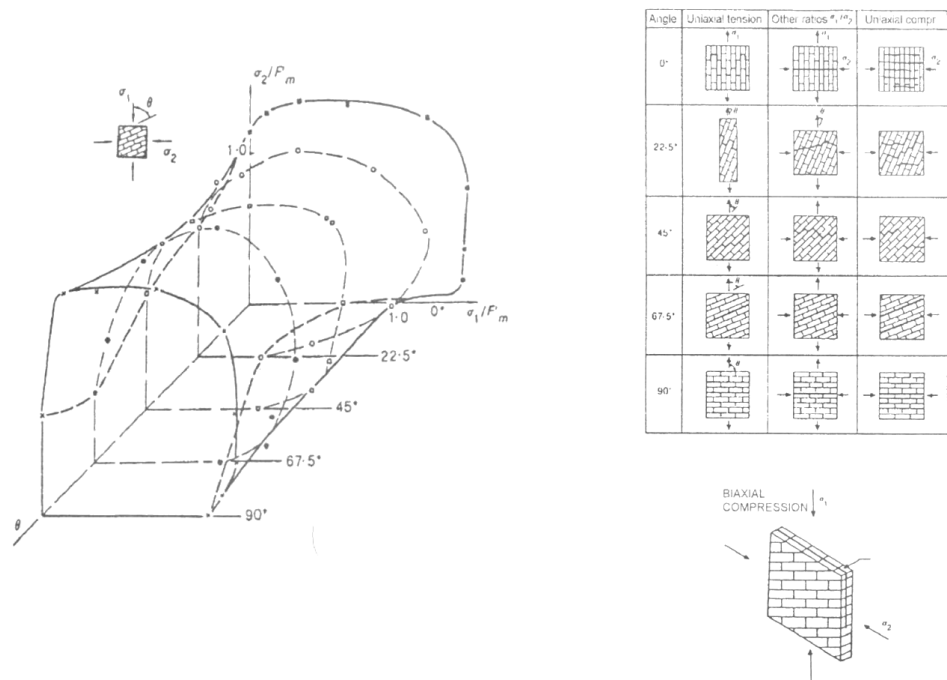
Experimental failure criteria for brick masonry walls under biaxial compression (left) and failure modes (right) for brick masonry walls under uniaxial and biaxial stress state (from Page, 1982).
